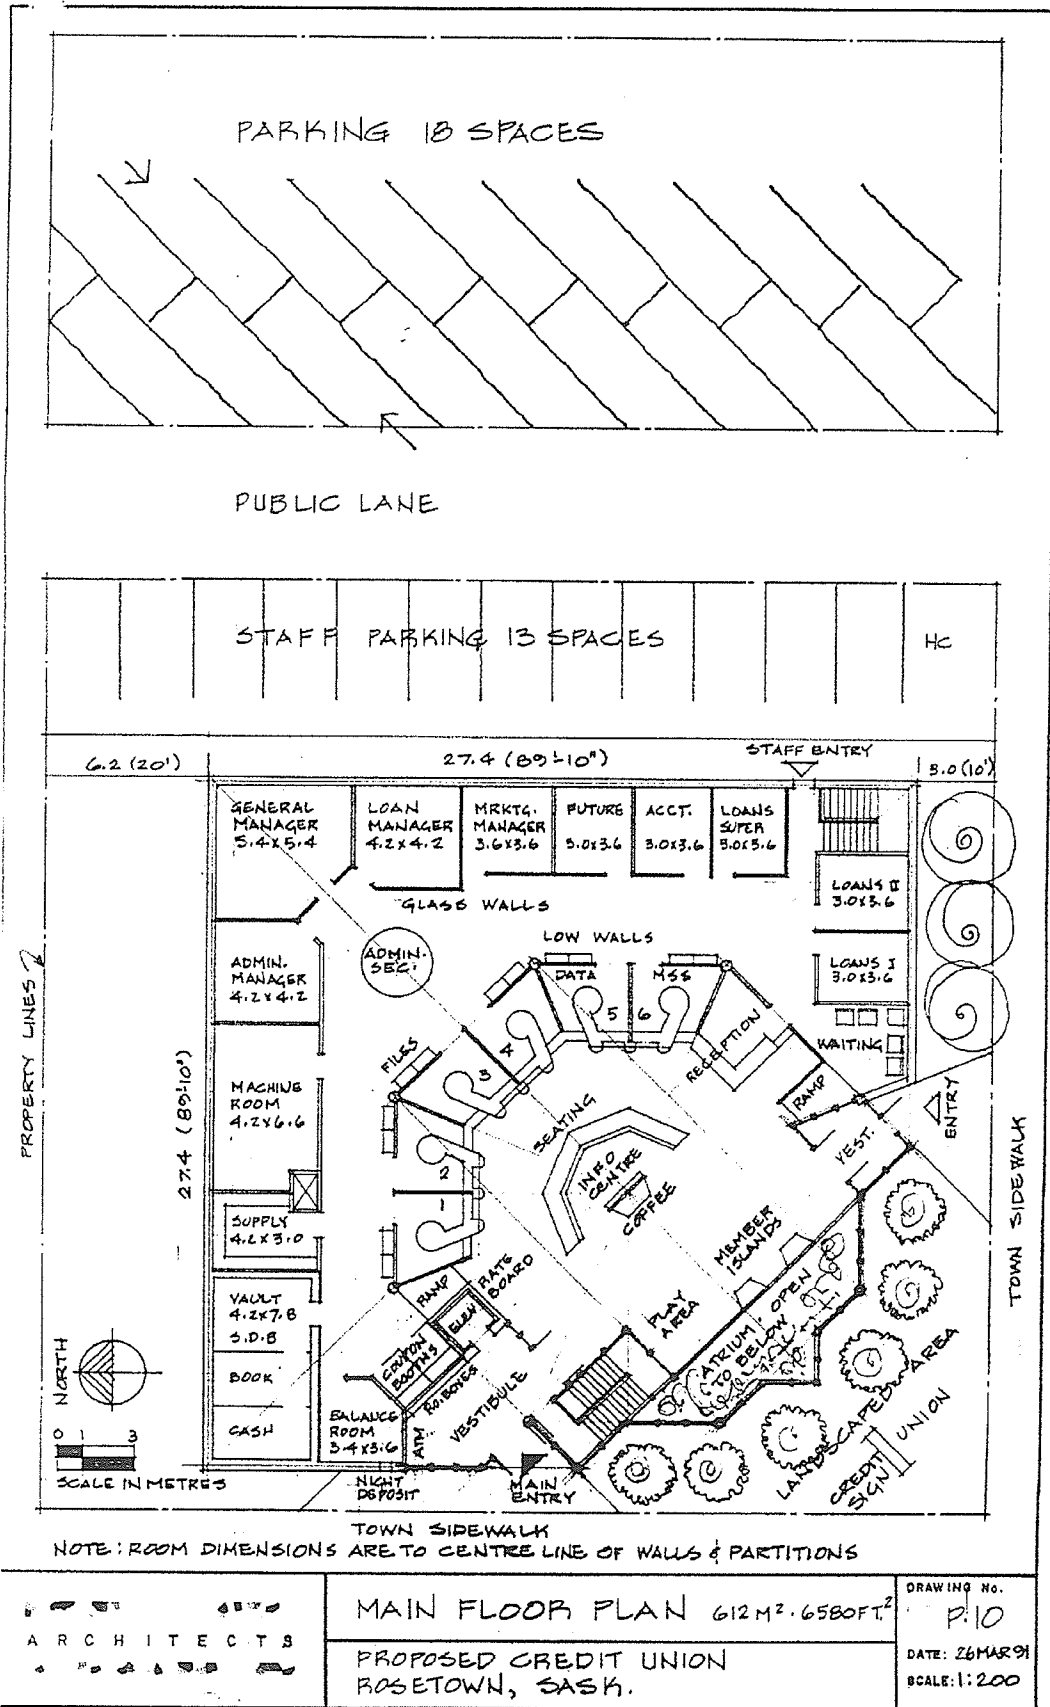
Architect design sketch, Main Floor Plan. Courtesy of the architect.
